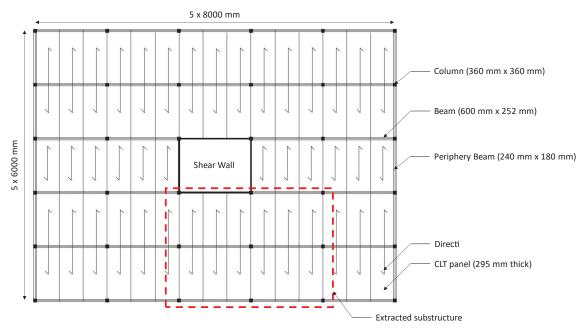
Plan view of prototype building and the extracted substructure (unit: mm)
